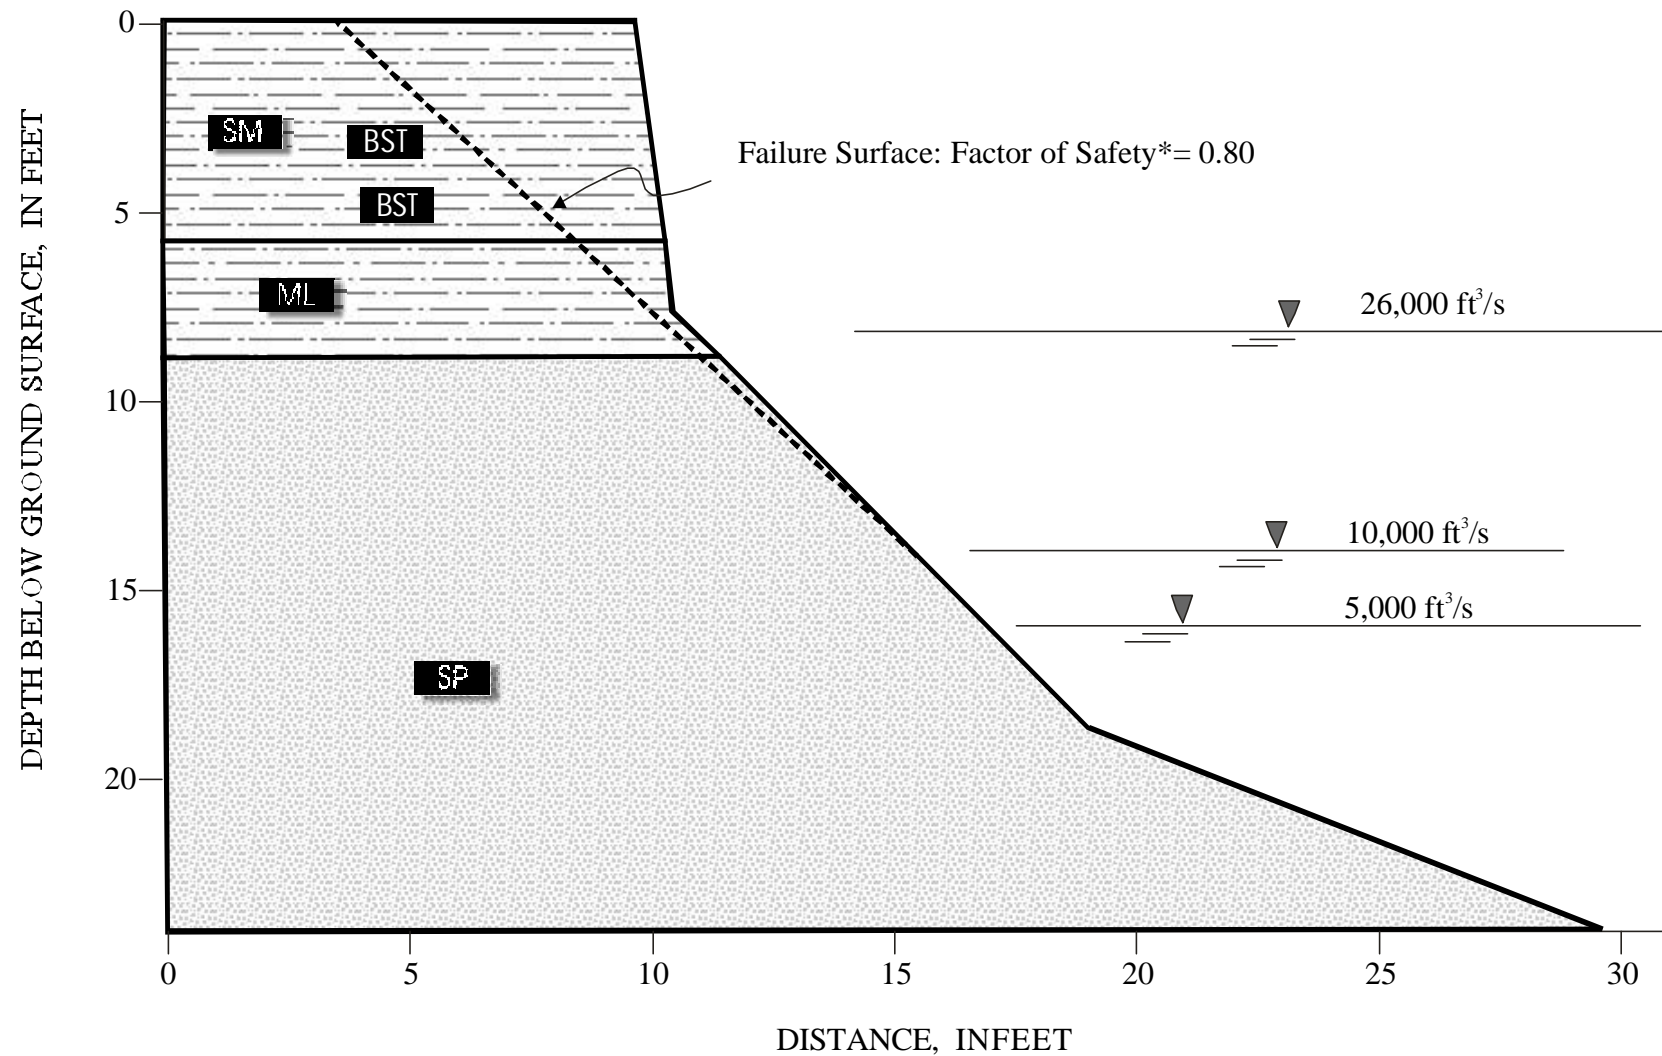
Idealized bank section at river mile 1646 (Mattelin) showing the modeled, planar critical failure-surface, factor of safety (F_s), river stage and groundwater levels, location of BST tests, and differentiated soil units.
